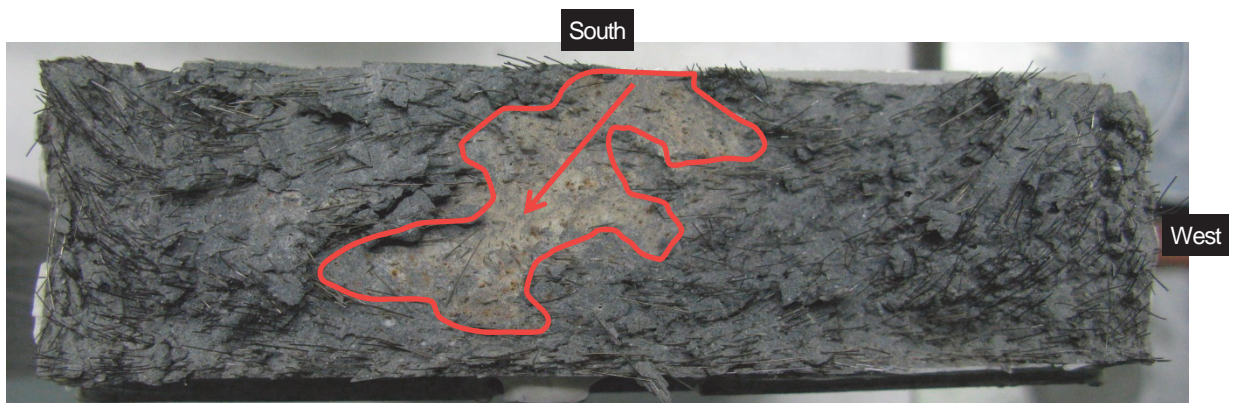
Fatigue fracture surface of S2.5-5 test specimen (lower half of the fractured specimen)
